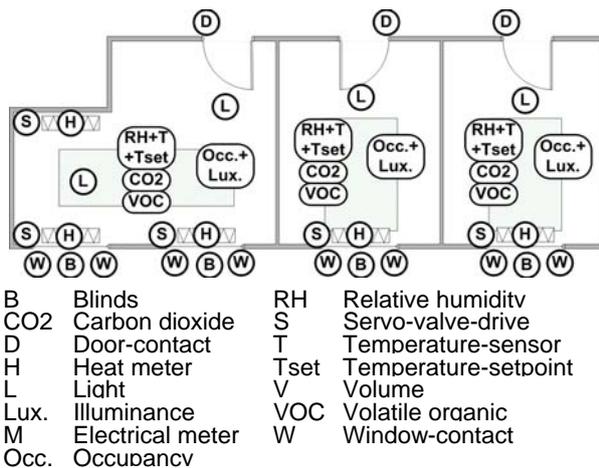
Floor plan including sensors of two office rooms and one conference room in Lehartrakt
